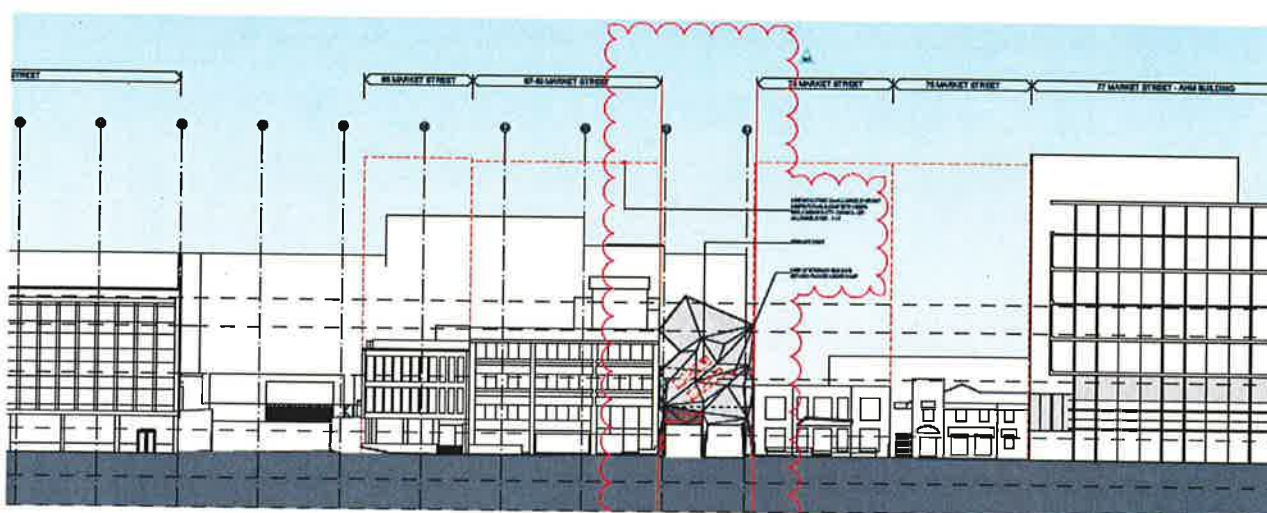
Proposed façade design to vehicle entry off Market Street (source: Proponents S75W EA)
